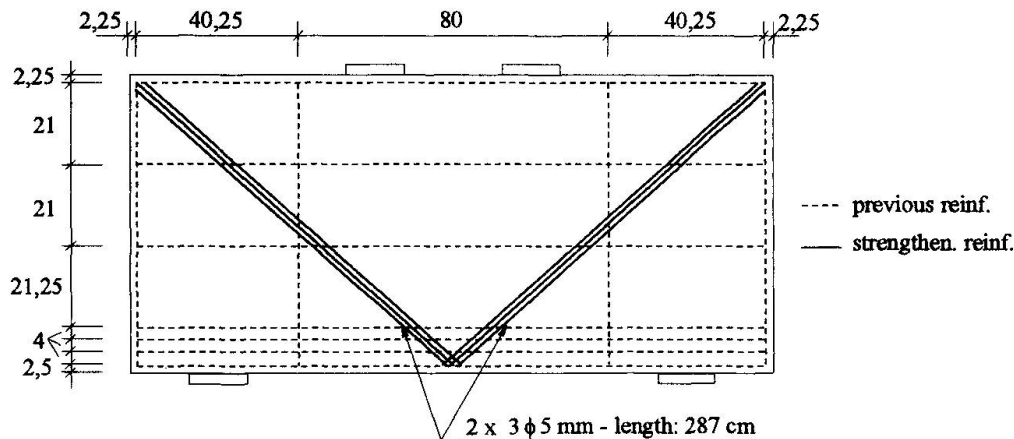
Beam 5/S strengthening reinforcement detail (cm)
